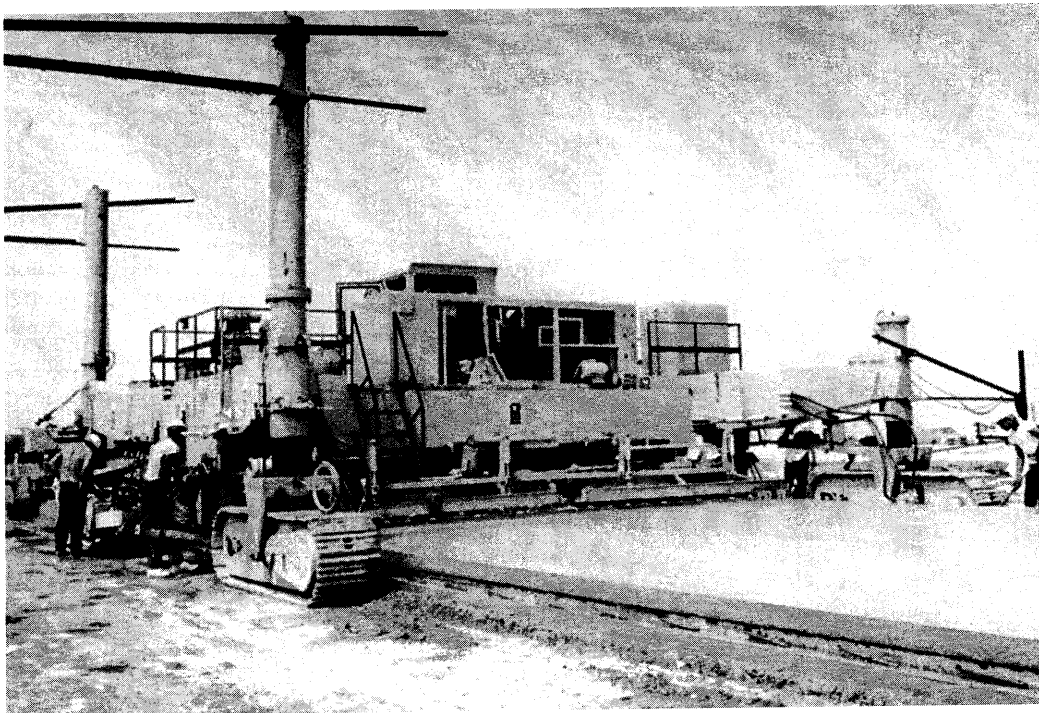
Large slipform paver in operation. (Courtesy of Terex Roadbuilding.)
